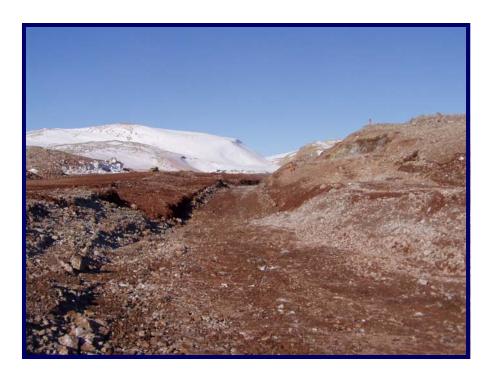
May 26, 2005 Backfilled spillway excavation with Type 2 riprap.
